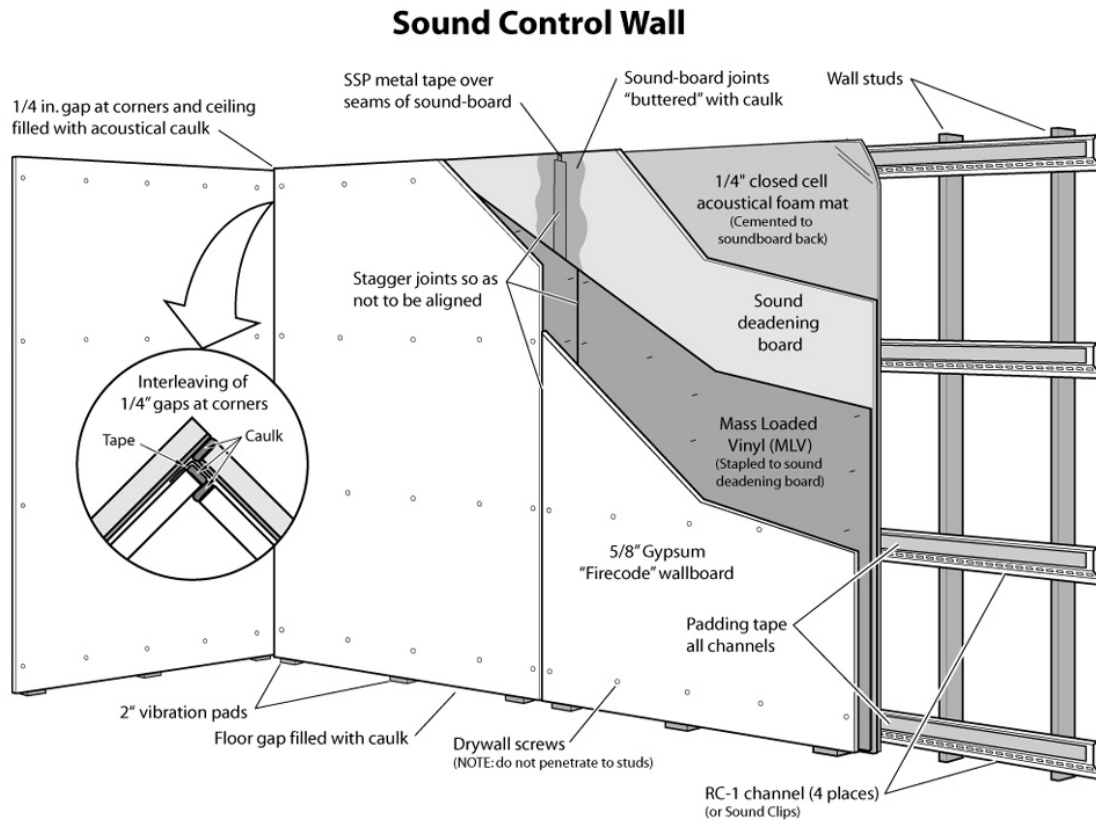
Schematic drawings and sketches for drywall installation works
